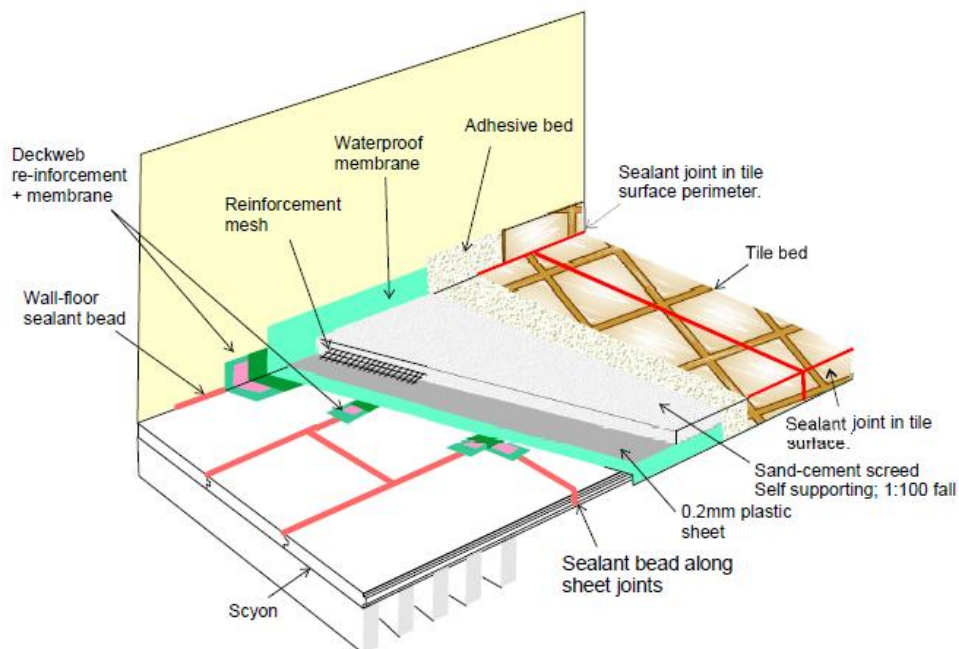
The second most common application ARDEX encounters is indirect tiling onto an external deck with a staggered sheet pattern and a liquid-applied membrane on a screed. Falls are normally created in the deck construction but can also be made in the screed (as shown in the schematic below). Some installers may decide to re-waterproof the screed as well to assist in suppressing efflorescence and preventing ponding water issues at the screed base where falls have not been created in the deck structure.
